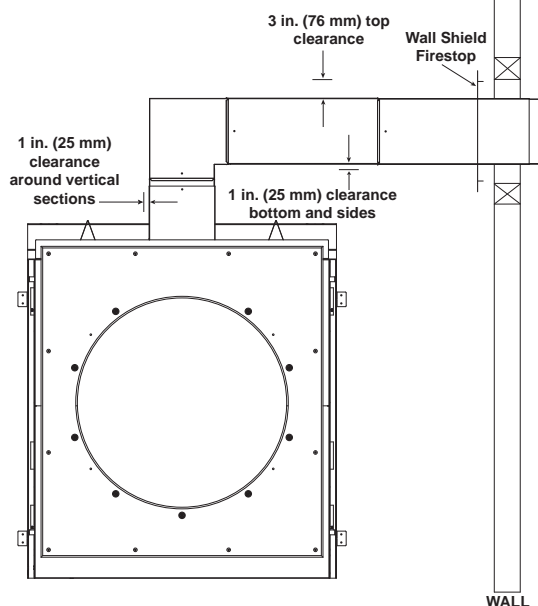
Horizontal Venting Clearances To Combustible Materials
